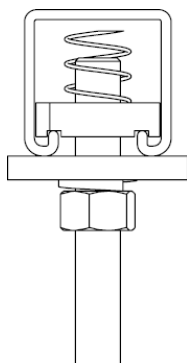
Threaded Rod Fully Threaded into the Strut Channel Nut
